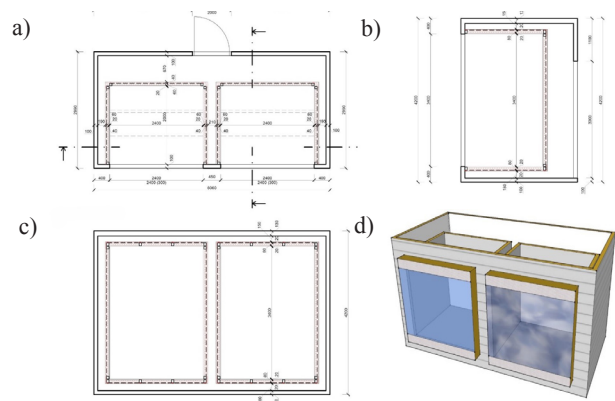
Construction schemes of the Twin Rooms (a – Floor plan, b – Cross section, c – Longitudinal section, d – 3D model)
